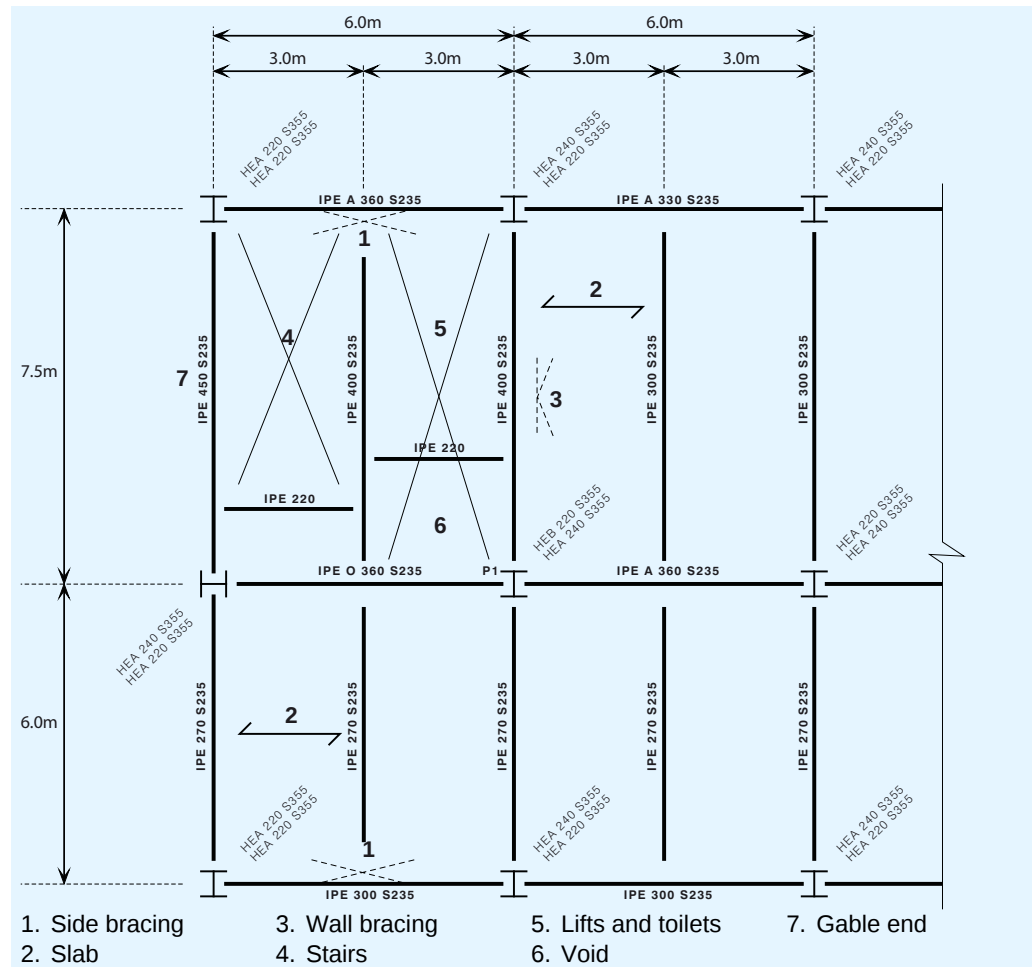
Short-span composite beam – example of floor steelwork arrangement for 4-storey rectangular plan building
